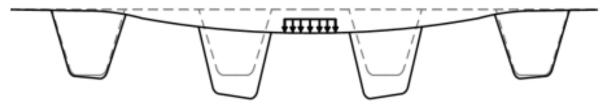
Structural system 2 (Håkansson & Wallerman, 2015)
